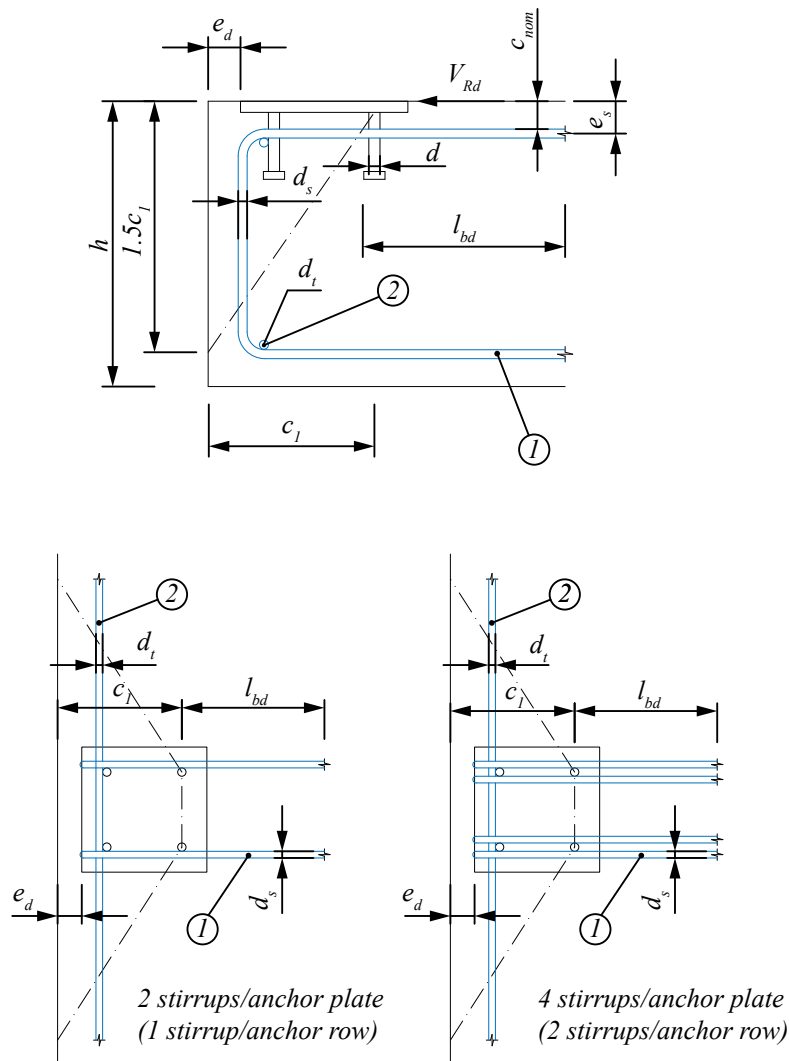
Supplementary reinforcement against shear failure at close position to free edge.
